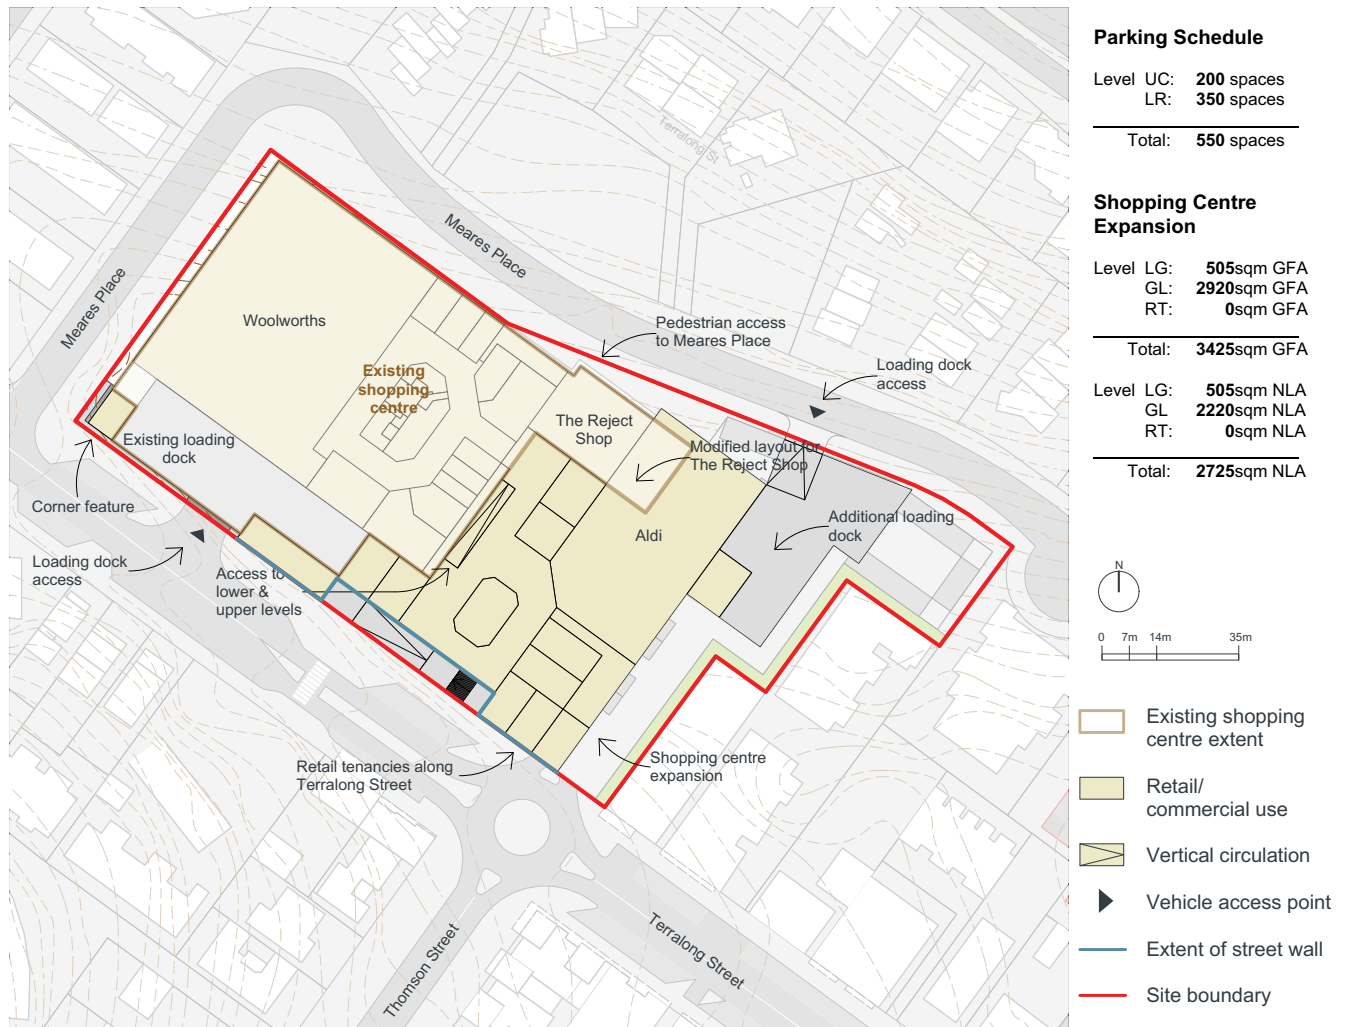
Kiama Village Shopping Centre - Site Layout Plan Ground Level
